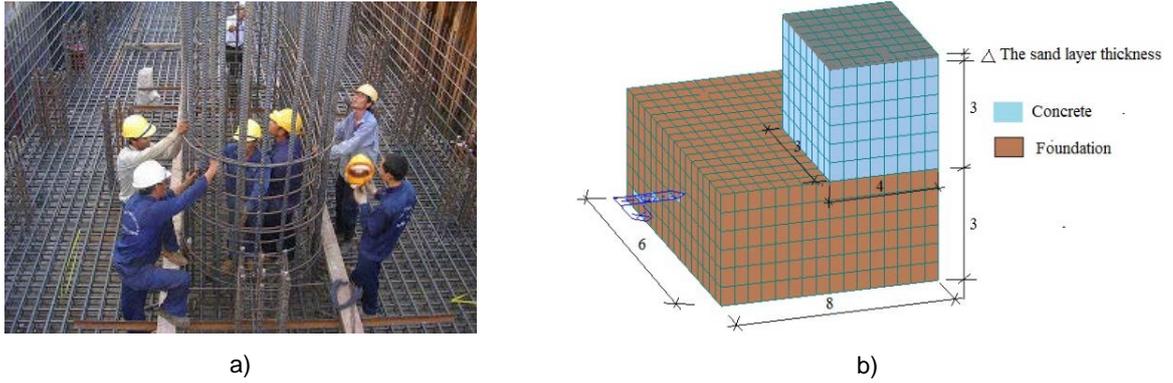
a-A bridge pier footing constructed in Vietnam; b – 3D model for temperature analysis with an insulation layer of sand, unit m.
